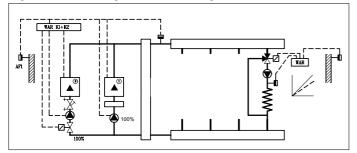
L.L.H. with boiler pump in a modular boiler installation
